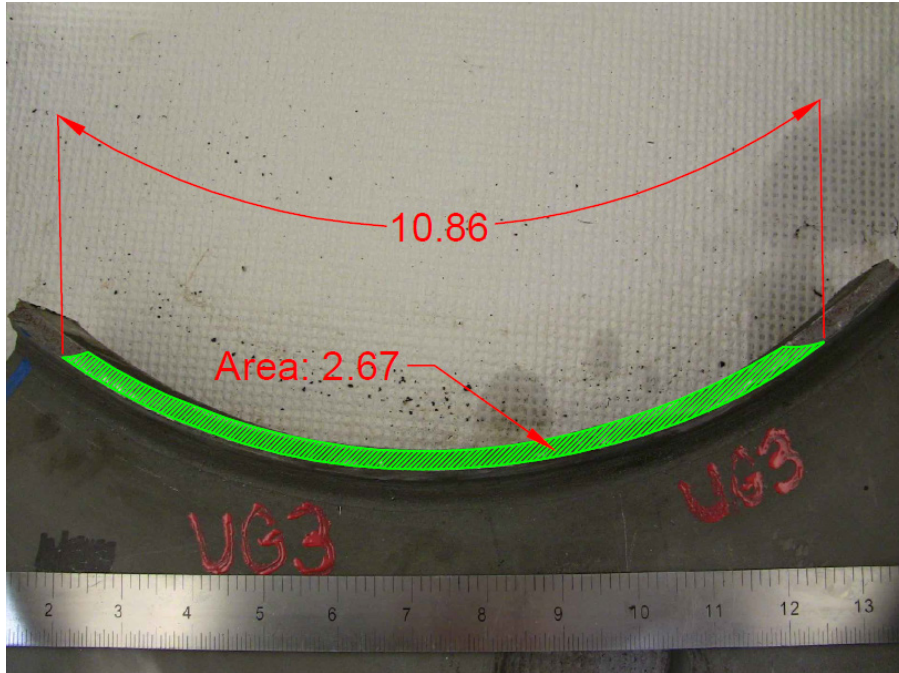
Photo. Specimen 1G3 fracture surface.
